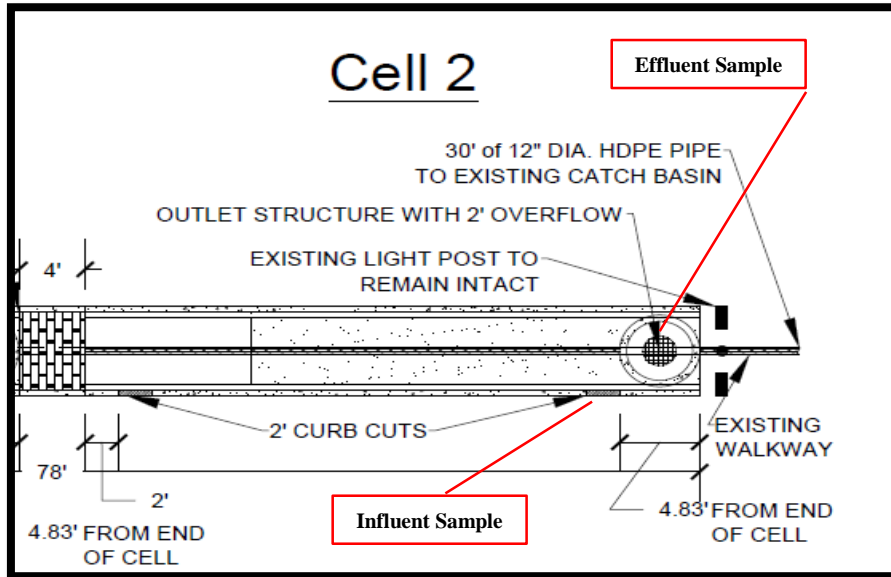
Plan view of Durham Innovative Bioretention Stormwater Control.
